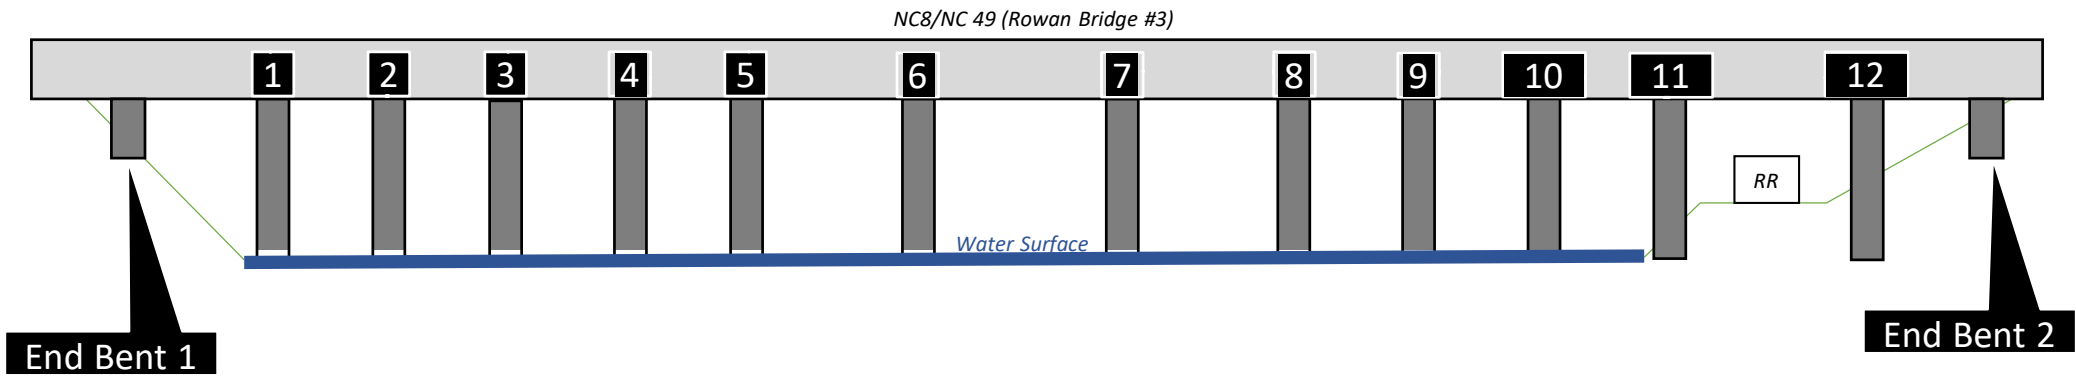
Existing Conditions and Bridge Reference (Profile – Facing Northwest)
